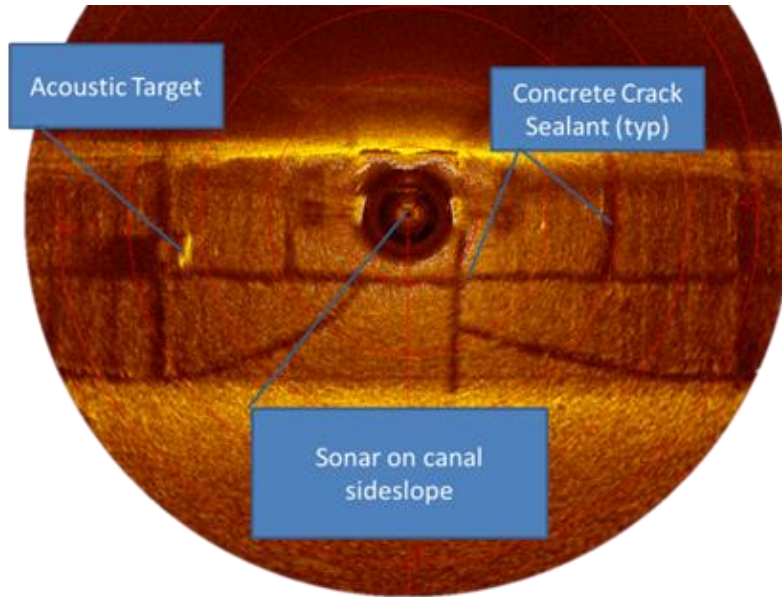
Sonar image of a concrete-lined canal bank repaired with flexible crack sealant.
